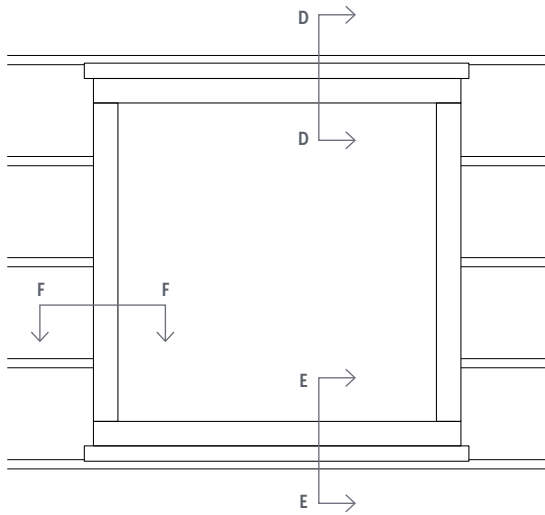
Section D-D Head & Sill Flashing To Be Turned Up And Down Behind Jamb Flashing Waterproof Membrane Excluded For Clarity
